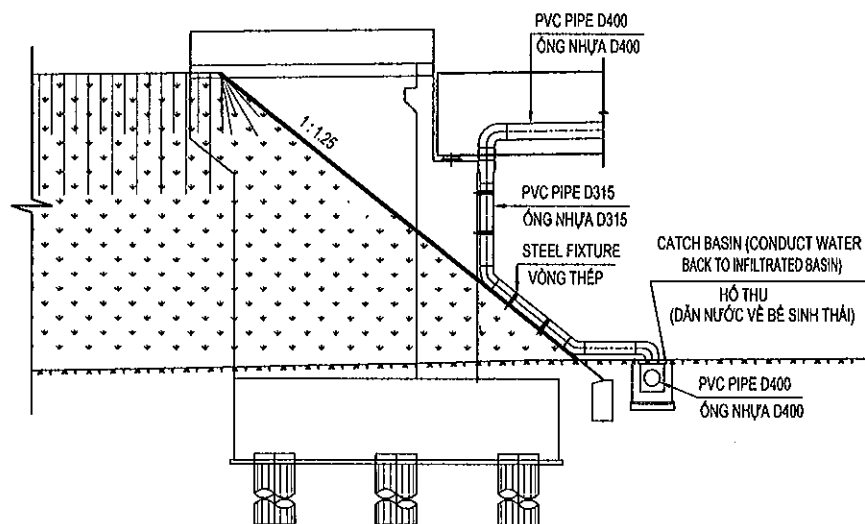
# DETAIL DRAINAGE AT ABUTMENT CHI TIẾT THO ẮT NẮC T ẮI MÓ
